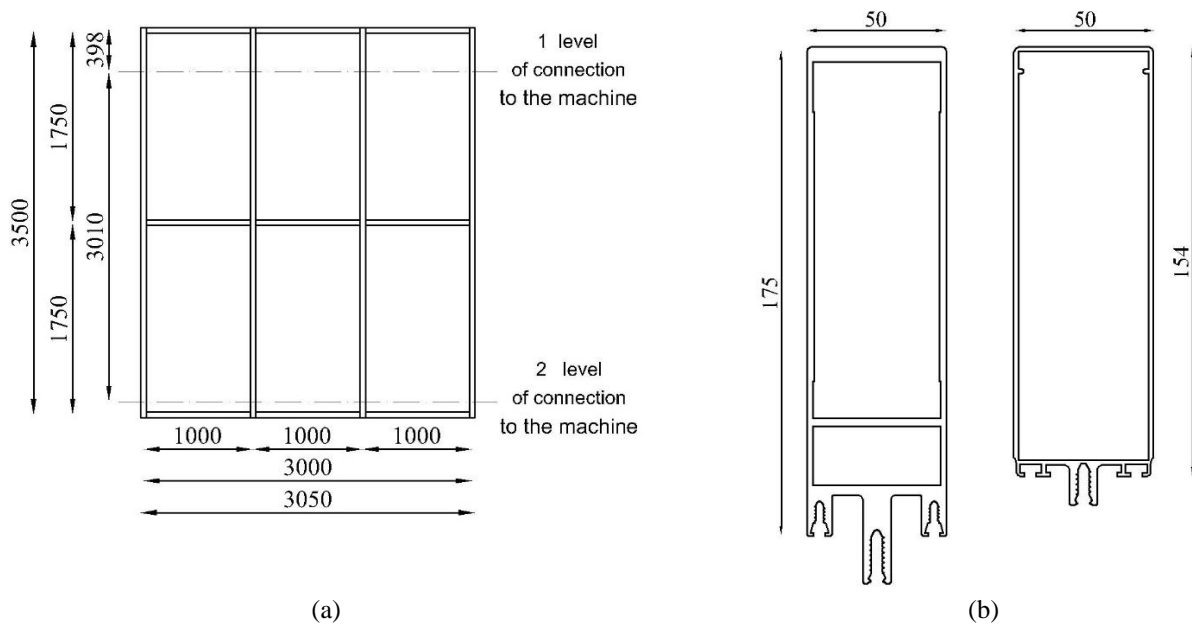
Glazed stick-built system: (a) front view, (b) cross-sections. Dimensions in mm.
